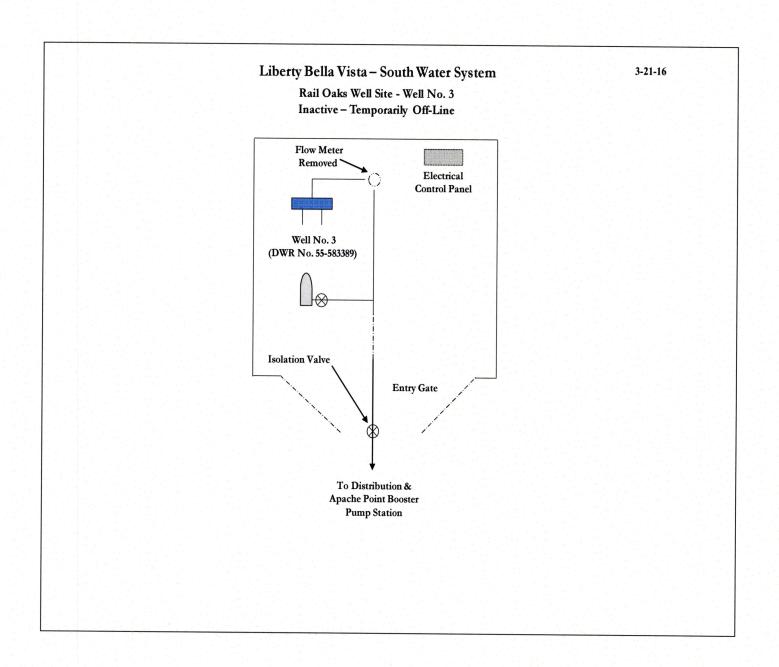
SOUTH WATER SYSTEM RAIL OAKS WELL SITE - WELL NO. 3
